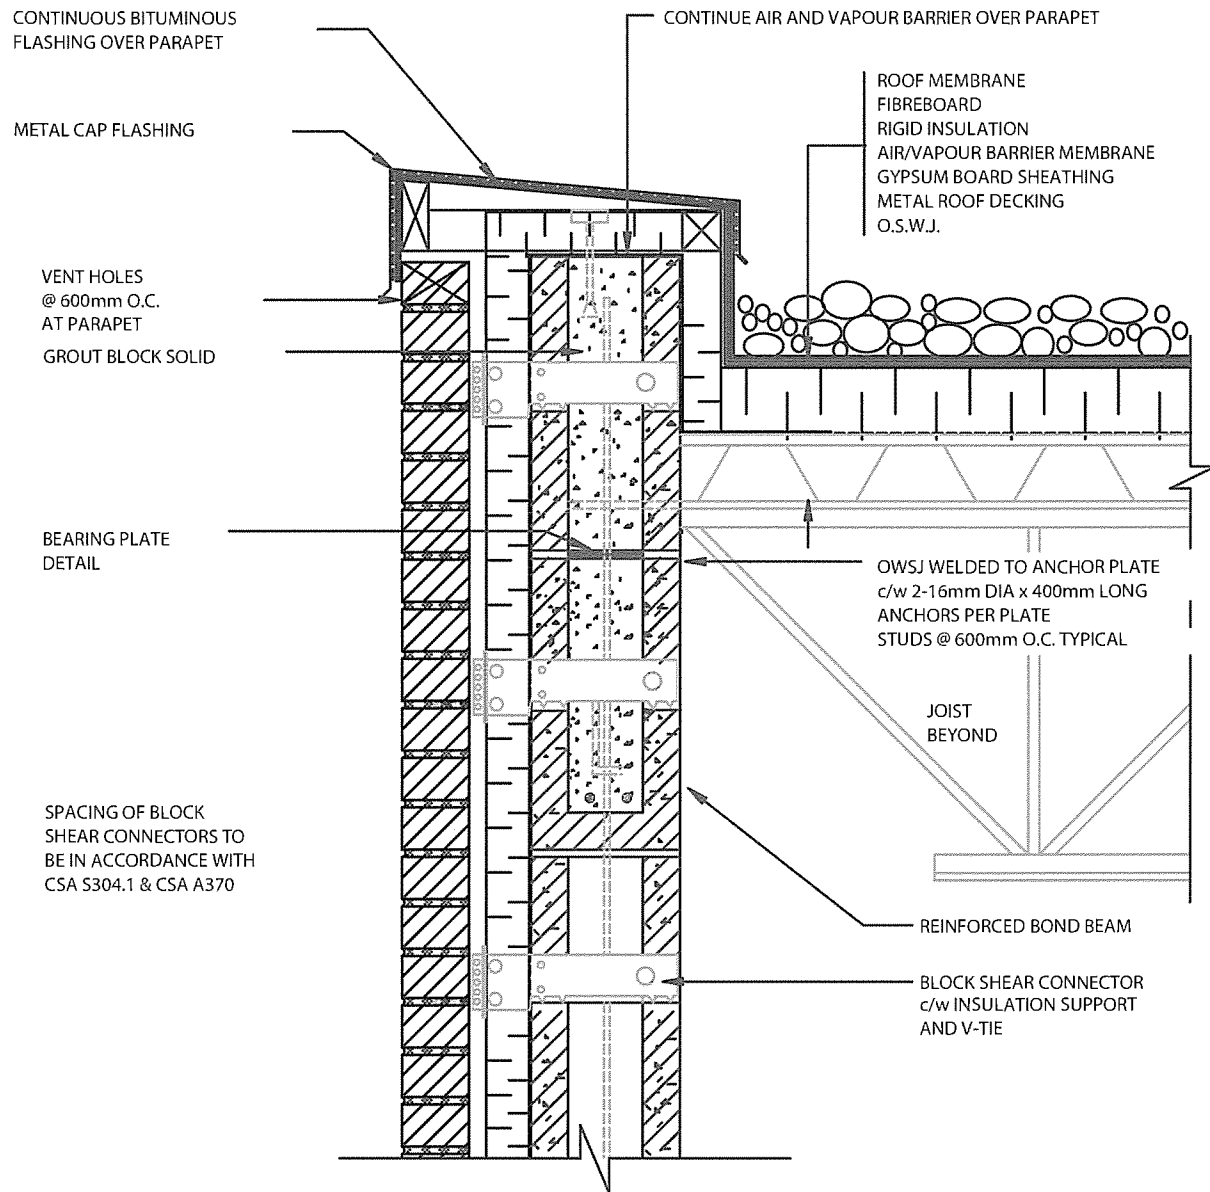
BRICK VENEER / CONCRETE BLOCK - PARAPET DETAIL @ O.W.S.J.
